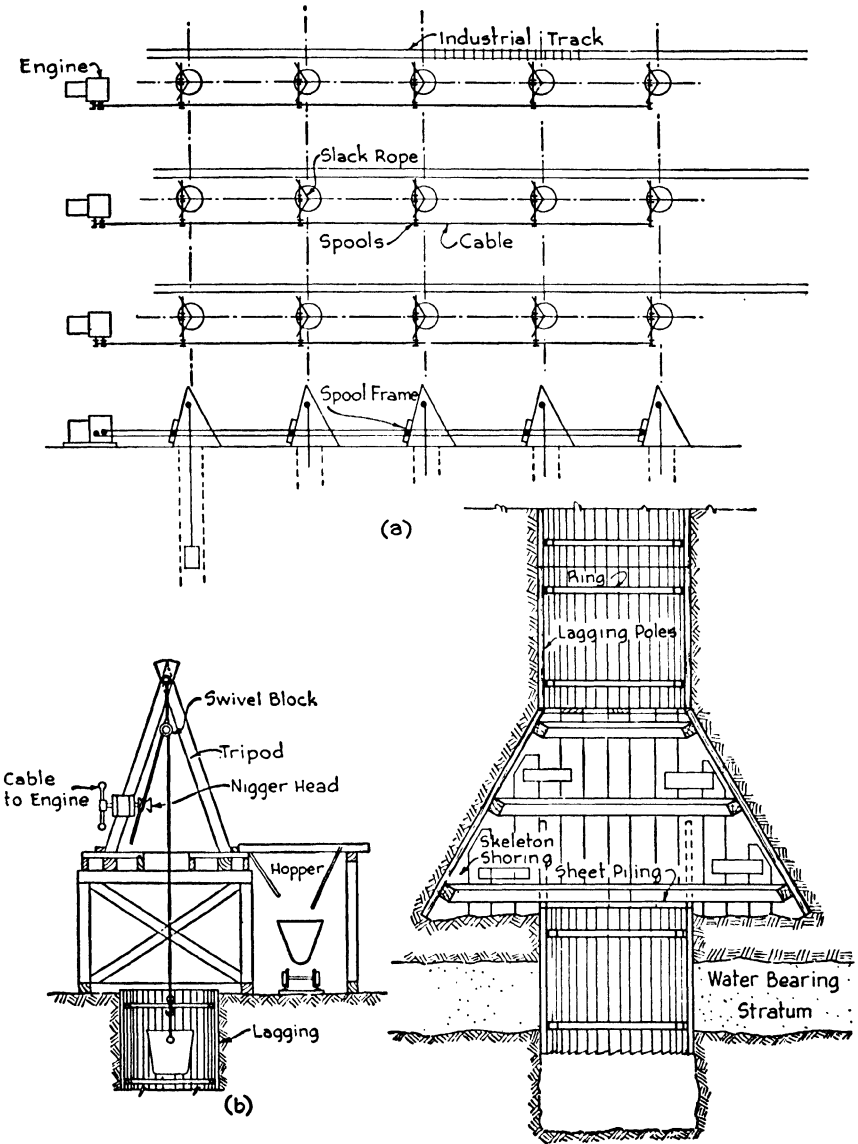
Sinking Open Well Caissons. (a) job set-up; (b) tripod rig over caisson; (c) passing through sand layer.
